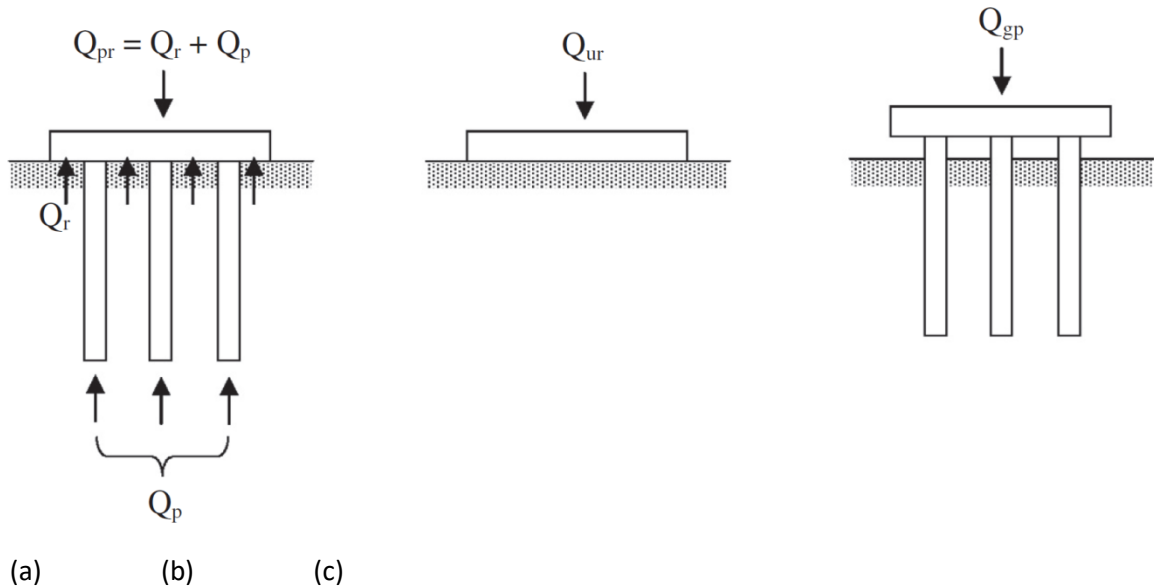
7. A typical configuration of (a) piled raft; (b) unpiled raft; and (c) group piles (Lee J. , 2014)
